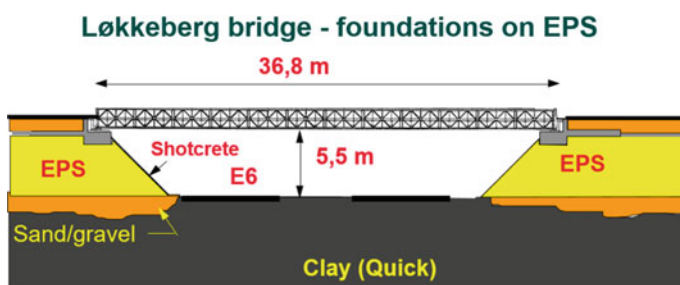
Bridge abutment founded directly on geofaom blocks (NPRA)
